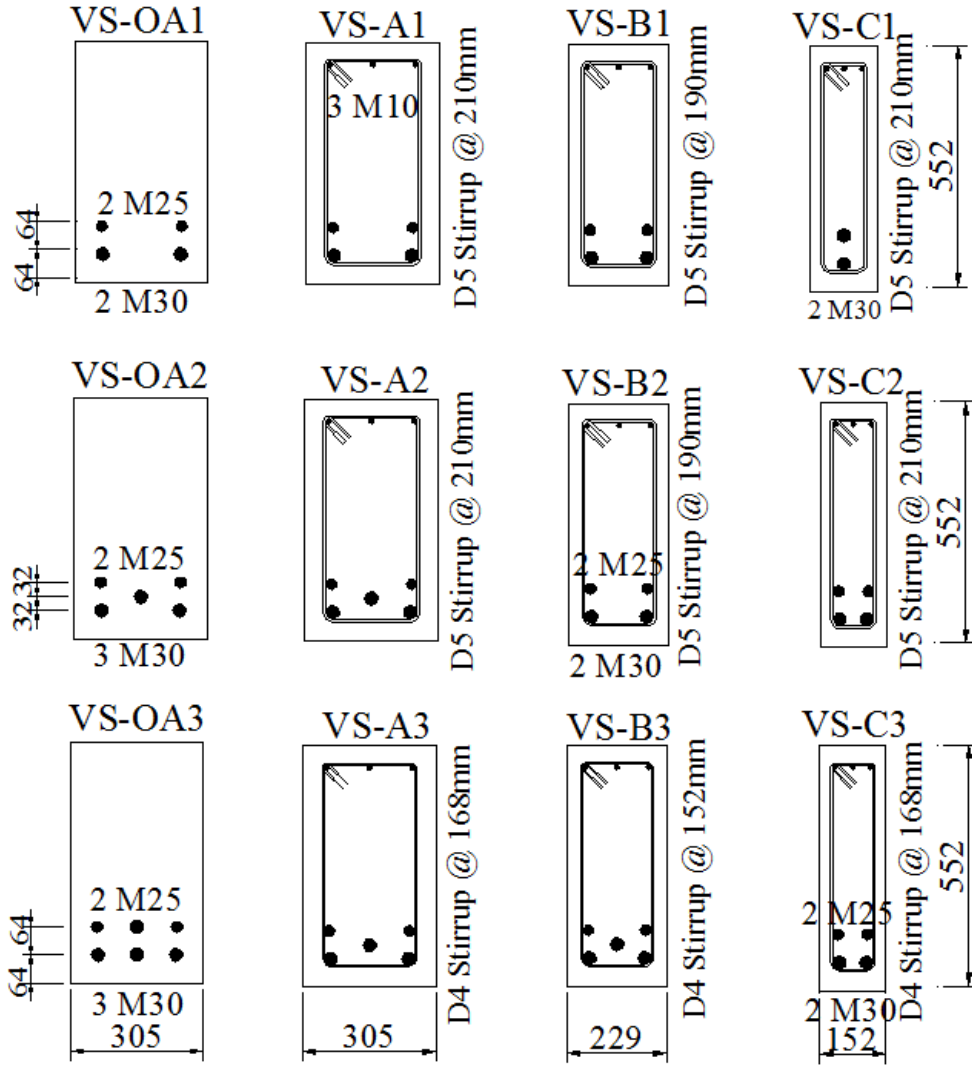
Cross Section Details of Vecchio and Shim Beams
